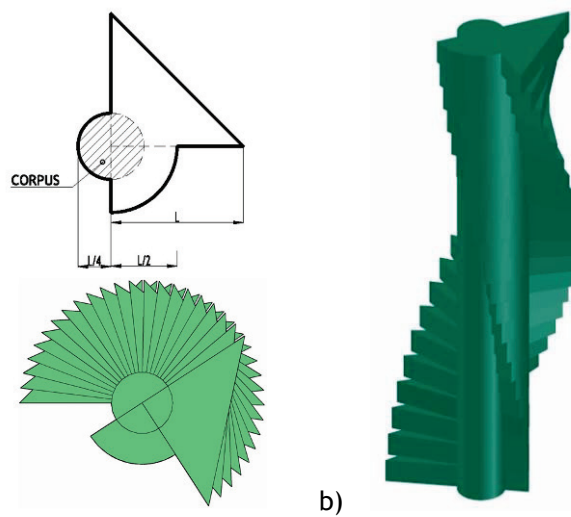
Structure No. 2.1 - a) Floor plan; top view b) 3D model
